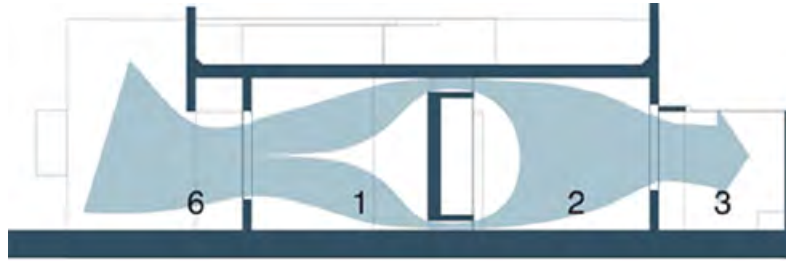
Cross Ventilation. Section: 1. Living room; 2. Bedroom; 3. Backyard; 6. Entrance.
